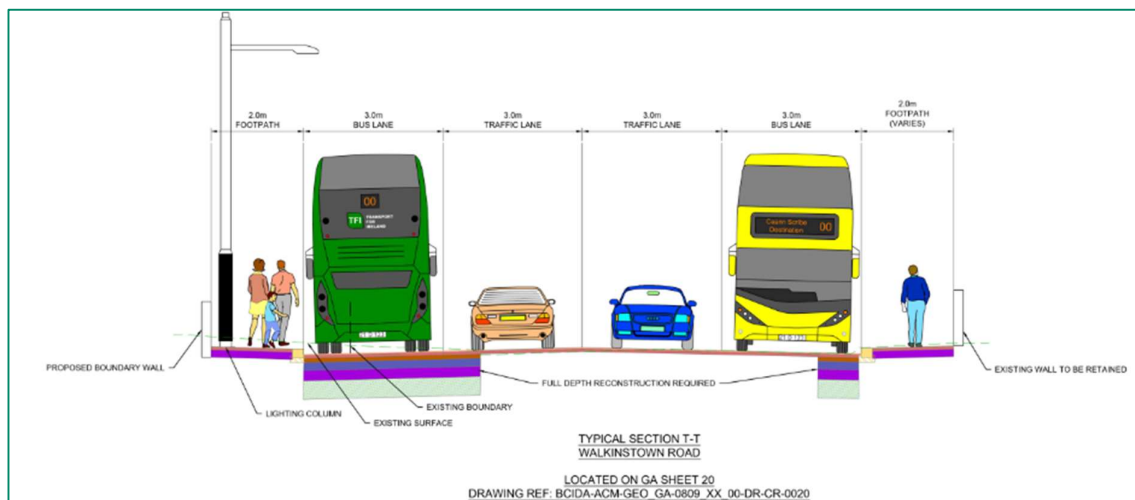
Typical Cross-section adjacent to Walkinstown Mall
